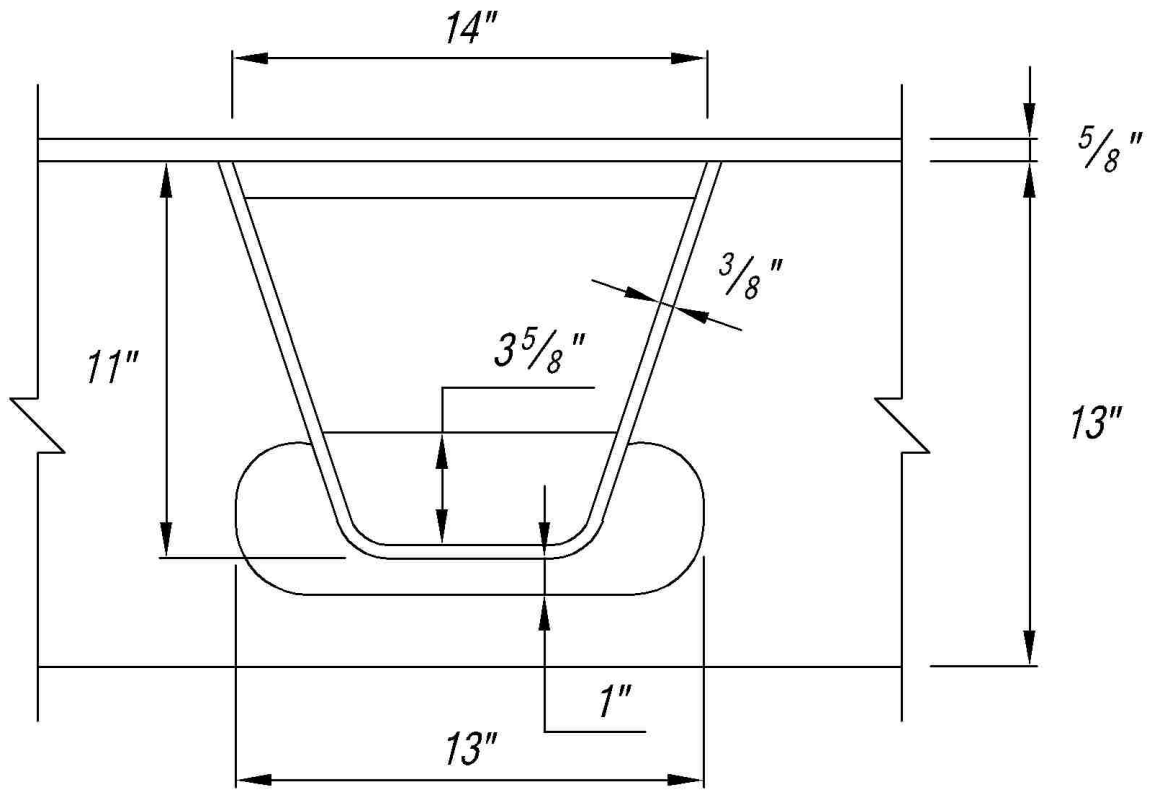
Dimensions of the Williamsburg Bridge rib-to-floor beam connection
